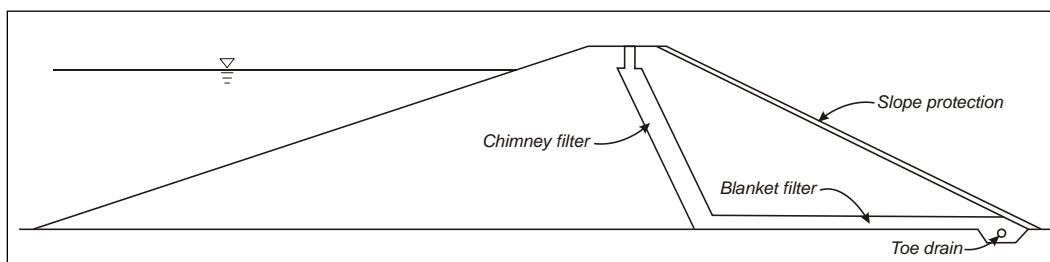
Simple cross section showing a chimney used in a new dam.
